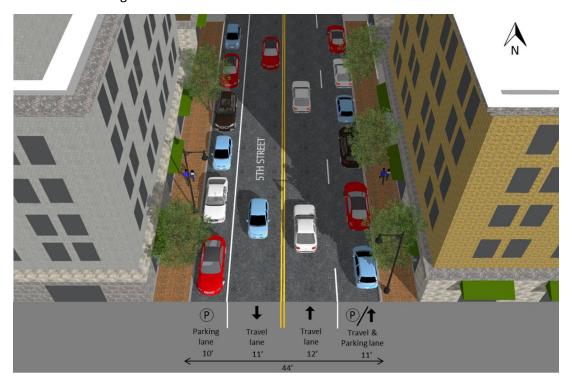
No-build (Alternative 0), 5th Street South of New York Ave
